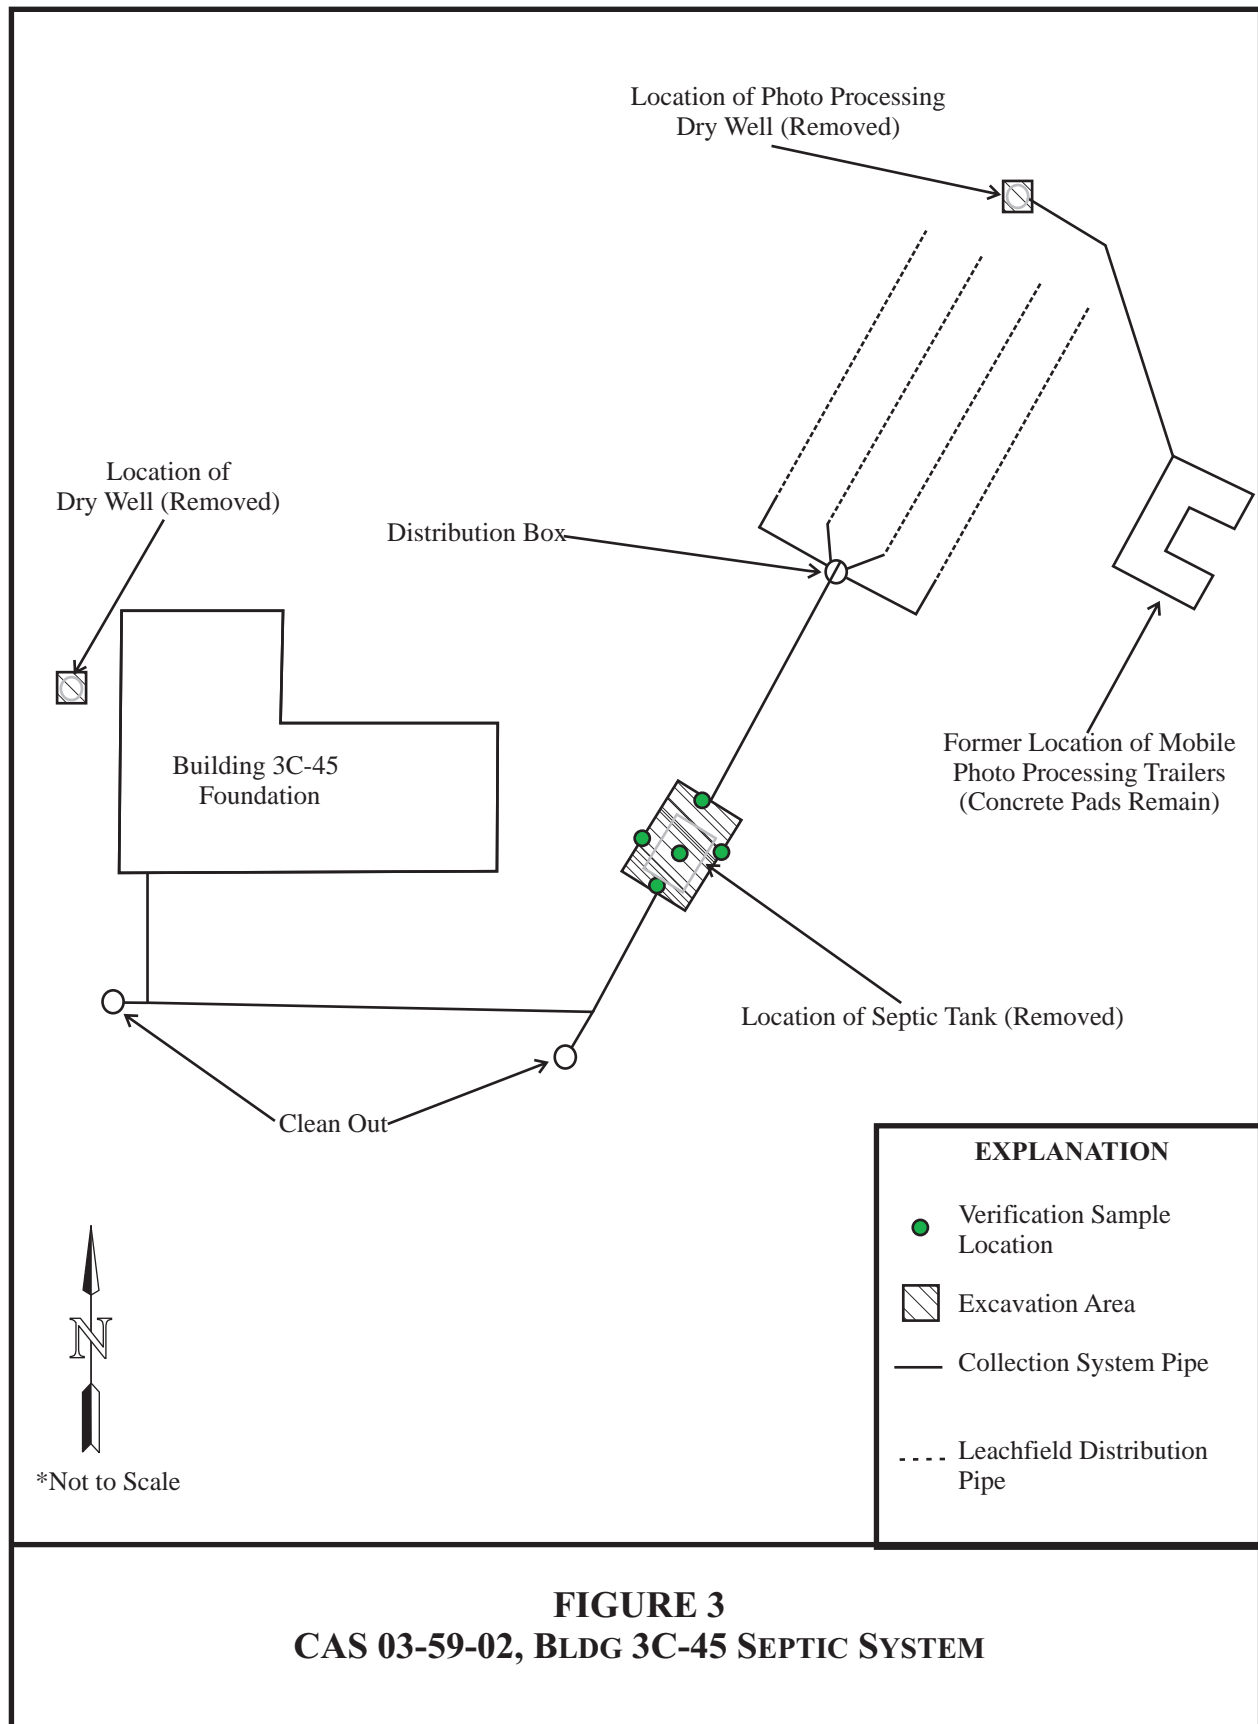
shows the site plan for CAS 03-59-02, which is located in the former Area 3 Camp north of Road 3-01 and west of Angle Road. The site consisted of a septic tank, distribution box, leachfield, two dry wells, and associated piping that serviced the former Building 3C-45 and adjacent photo processing laboratory. The influent and effluent portions of the septic tank together contained approximately 700 gal of liquid and solid waste. Characterization results reported TPH-DRO contamination above the action level in the solid and liquid phases of the material contained within the septic tank, as well as gross alpha and beta radiation exceeding the recommended levels for sewage lagoon disposal within the liquid phase (NNSA/NSO, 2004). Additional characterization sampling performed prior to the onset of fieldwork confirmed that the solid and liquid material within the septic tank did not constitute a radiological or hazardous waste. Analytical results are available in Appendix B of this report.
